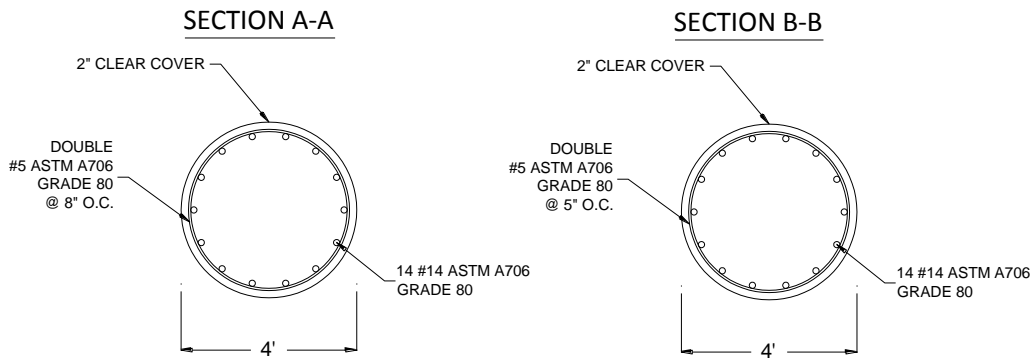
Cross section of column (Lotfizadeh, 2019).
